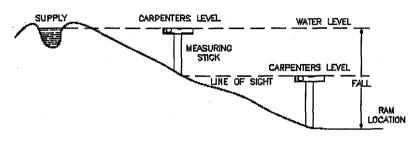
Determining Vertical Fall (F) and Lift Elevation (E) Using a Carpenter's Level
